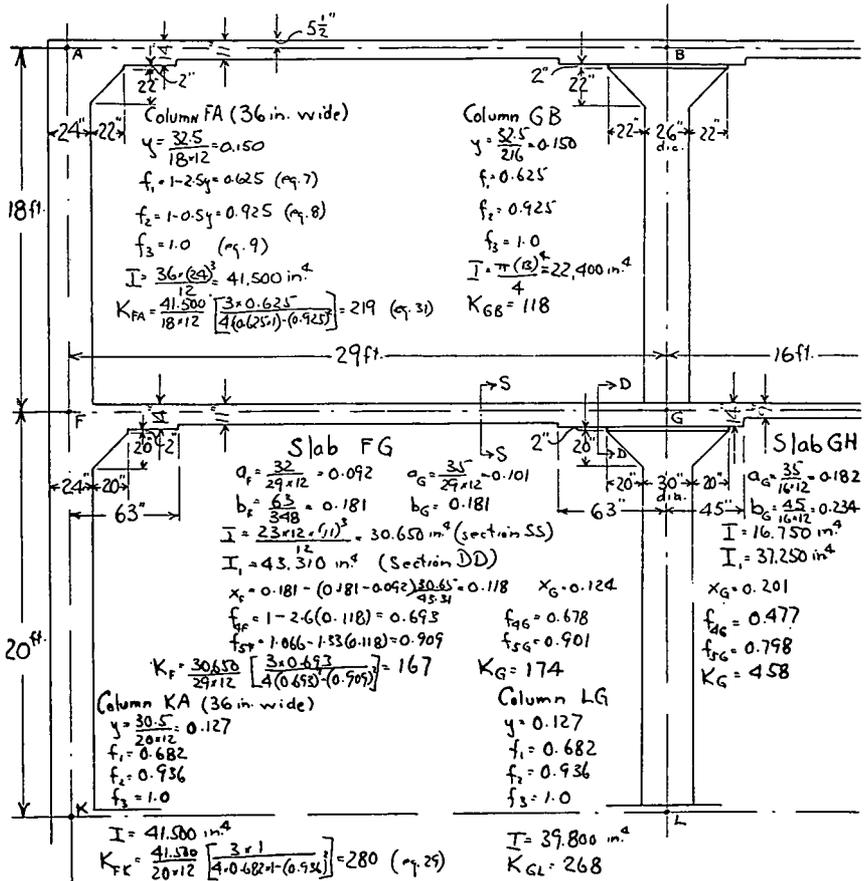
SLAB AND COLUMN CONSTANTS FOR SPAN FG
